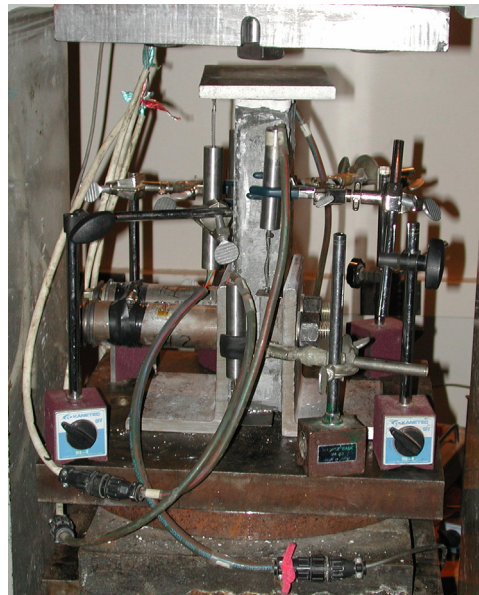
ECC connection specimen in test frame with LVDTs prior to testing
